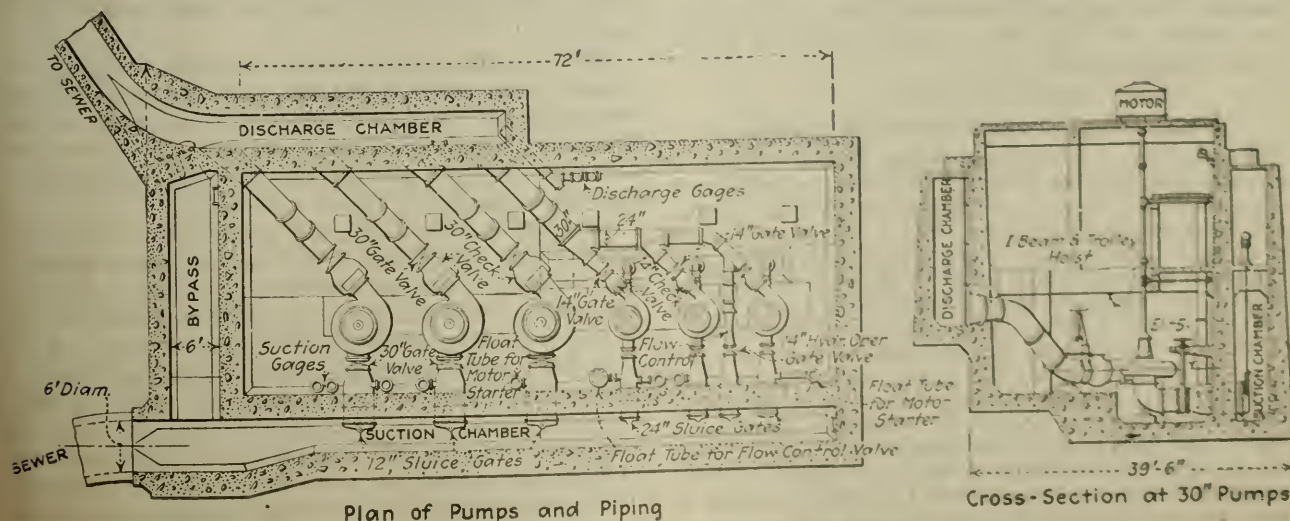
PLANT ARRANGEMENT AT EVANSTON PUMPING STATION
